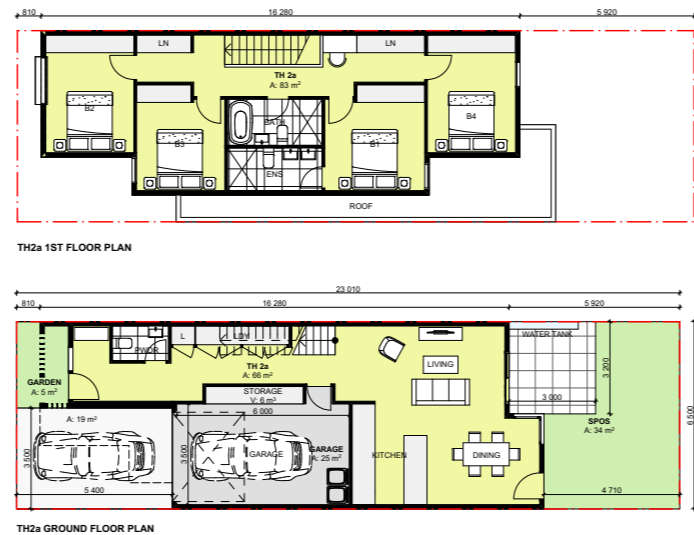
Townhouse Type 2a (Source: Plus Architecture)
